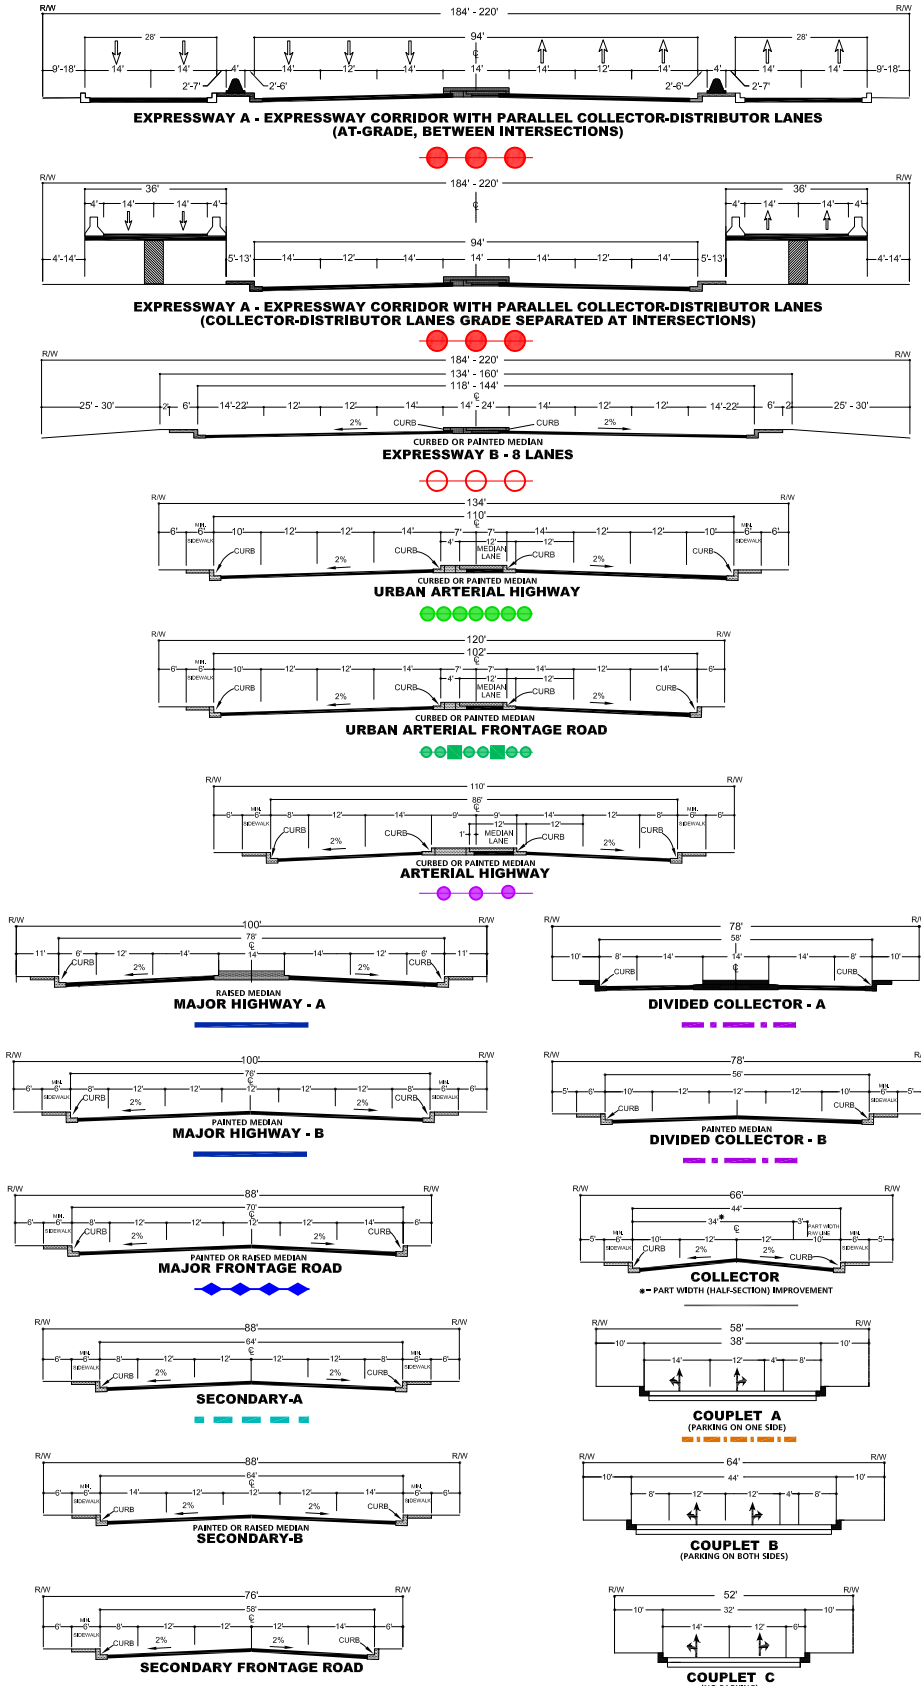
CITY OF BEAUMONT GENERAL PLAN CIRCULATION ELEMENT
